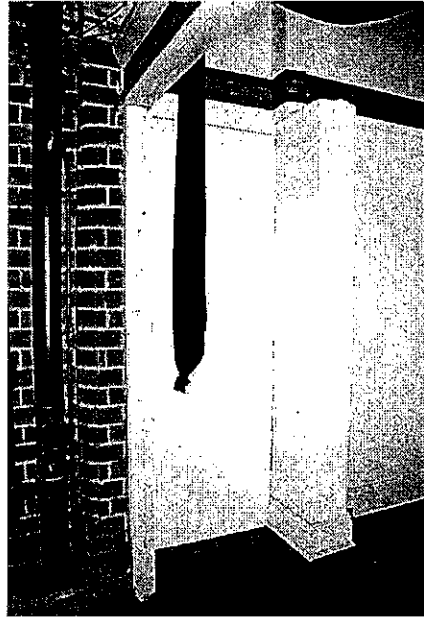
Interior, Booth (space B01). Detail of projecting wall nib, and blocked up door opening (west wall).
